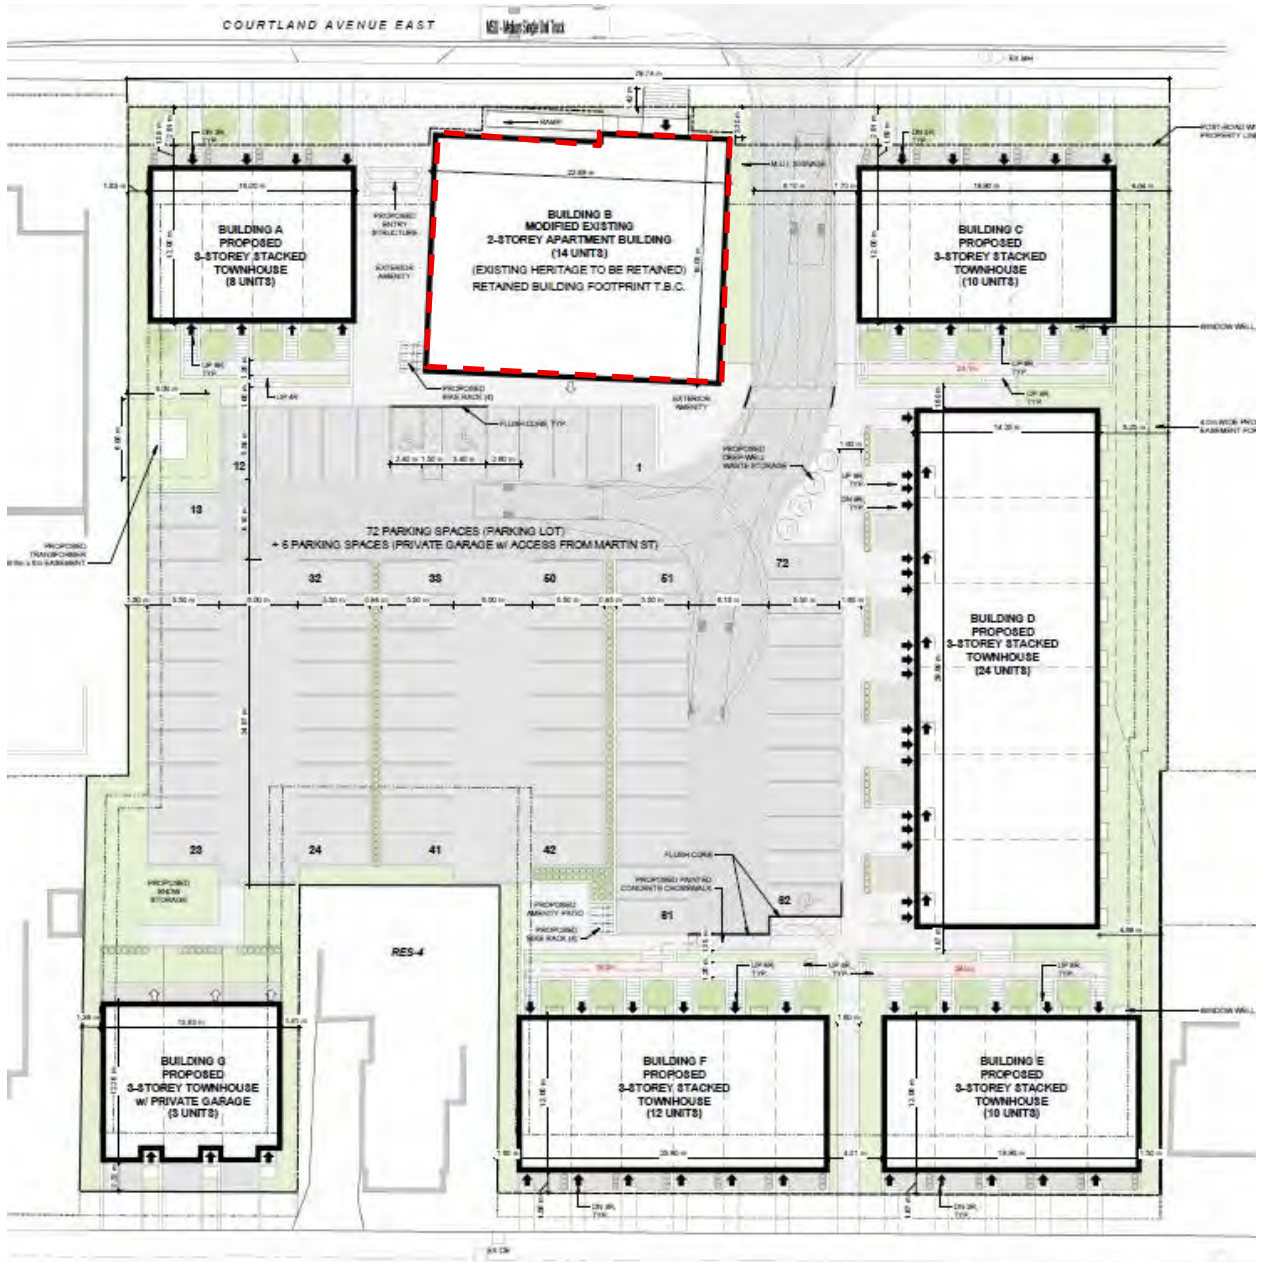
Site Plan noting the retained portion of Building 1 (outlined in red) (McCallum Sather, 2025)
